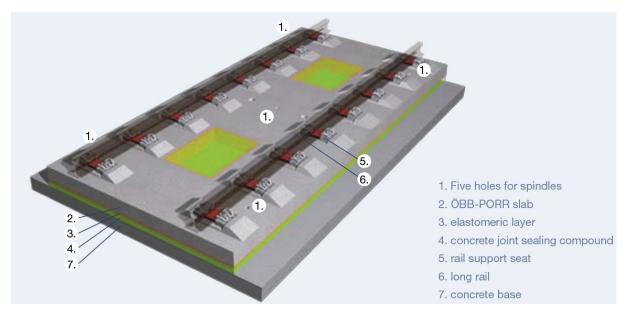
ÖBB-PORR Slab (PORR Bau GmbH, 2016)
